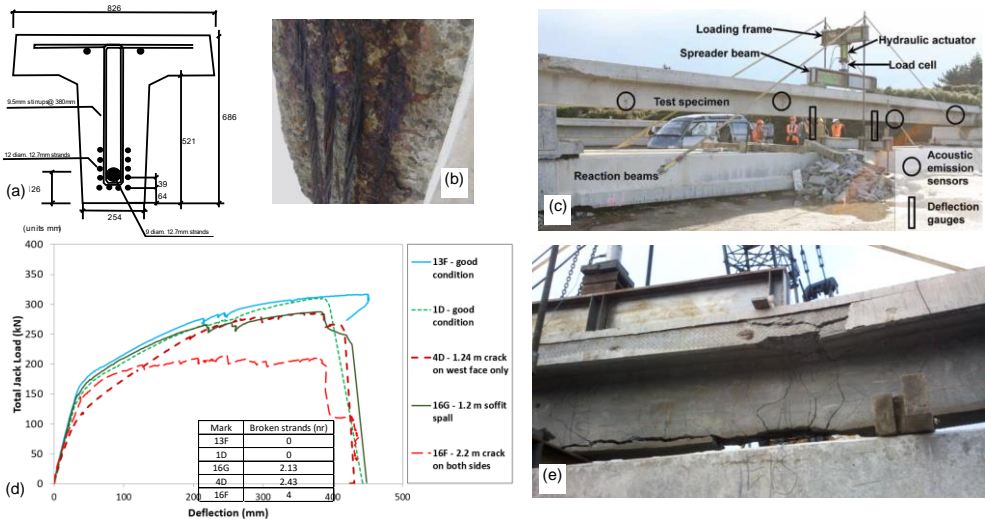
Bridge beams [2]: a) cross-section; b) corrosion of bottom strands c) test setup; d) load-deflection; e) delamination in heavily corroded zones, load test at failure.
